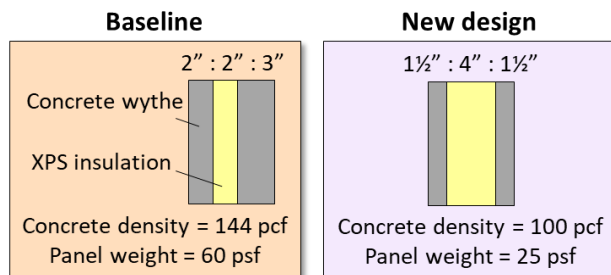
Typical assembly of precast insulated wall panel and new design to lower the weight of the panel by more than 50%.
